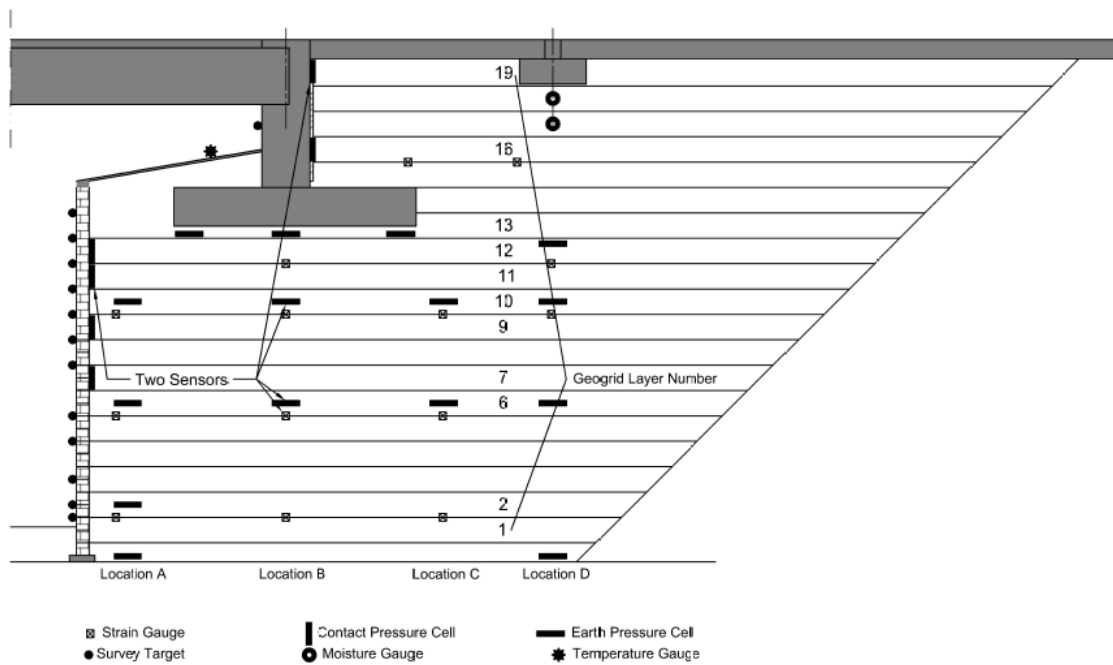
Layout of Instrumented Section 800 (redrawn after Abu-Hejleh et al. 2002).
